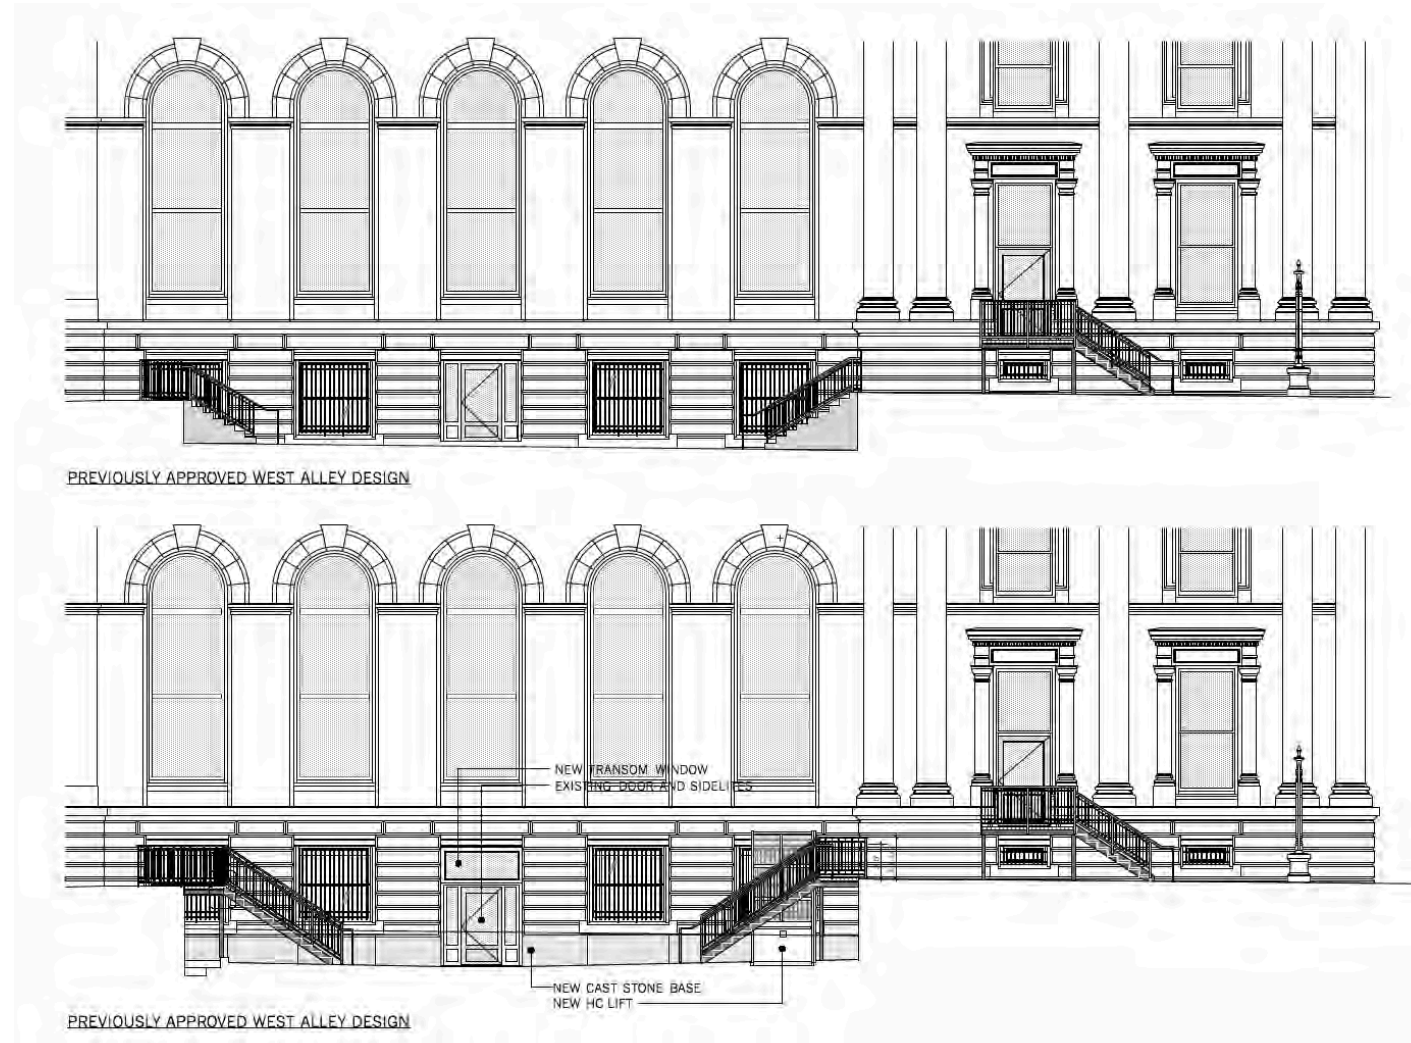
Approved and proposed elevations of the west alley. Changes proposed include: lowering the alley floor to the level of the basement, lowering the existing center door to the basement level and adding a transom window above, adding a new cast stone base and adding a HC-lift.
